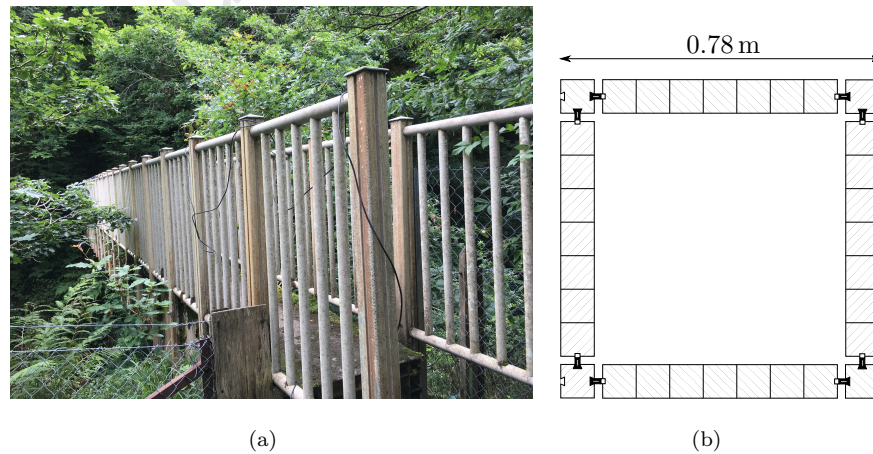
Lively footbridge (a) general view and (b) cross section of individual units that form the footbridge deck.
